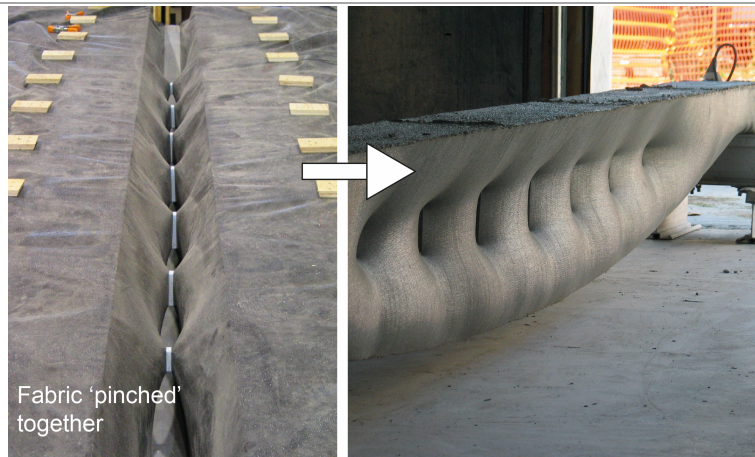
Example formwork system - 'T' beam cast at the University of Bath
